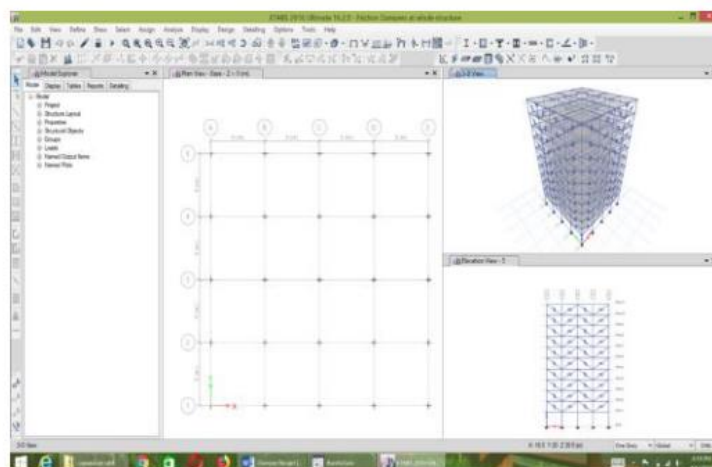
G+10 Multi-storey R.C. Building with Friction Dampers at All External Joints
